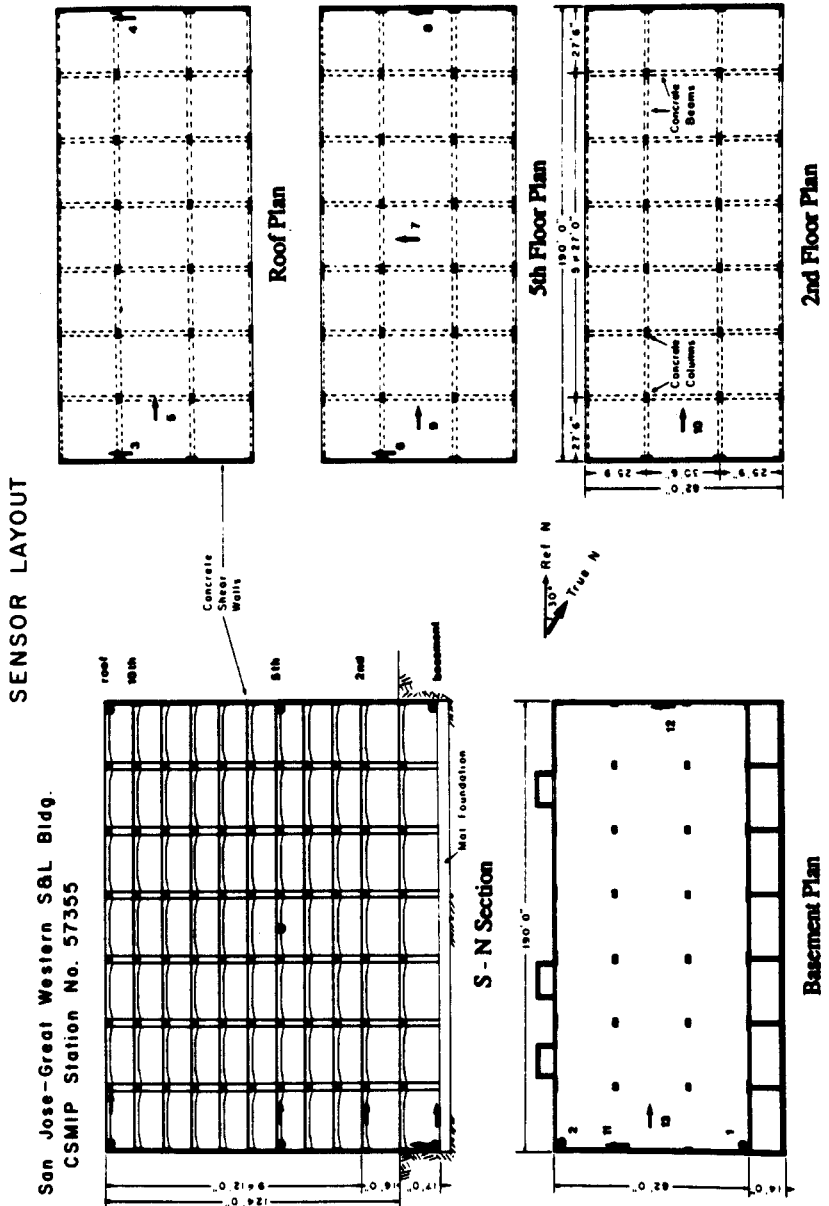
Sensor layout in the Great Western Savings and Loan Building.
